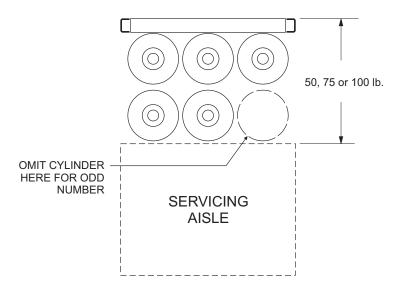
Multiple Cylinder Mounting, Arrangement C
